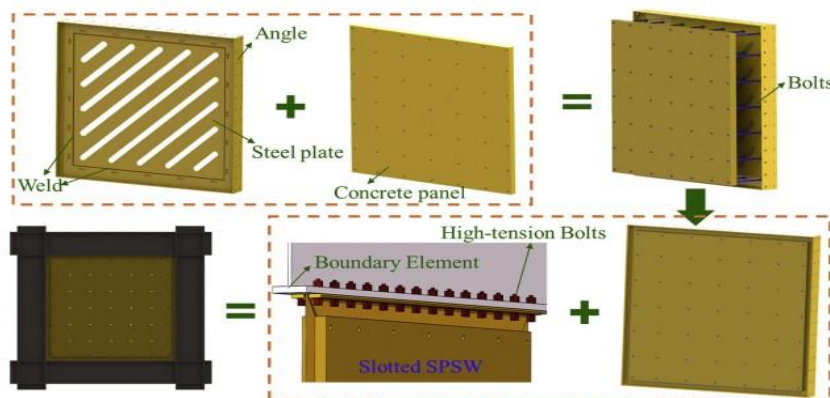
Configuration of the slotted steel plate shear wall sandwiched between two precast concrete panels [16]
